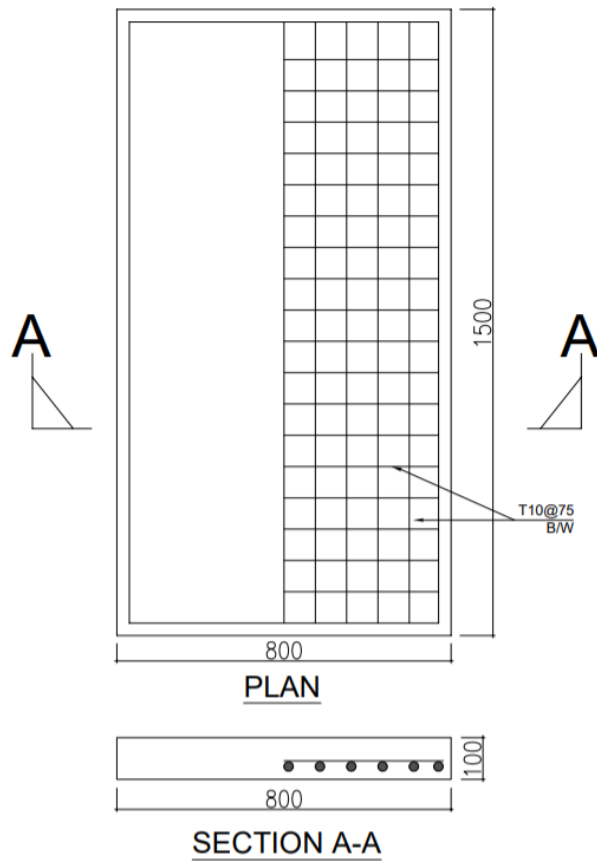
; Reinforcement Arrangement for the Test Specimen (Series 1)
